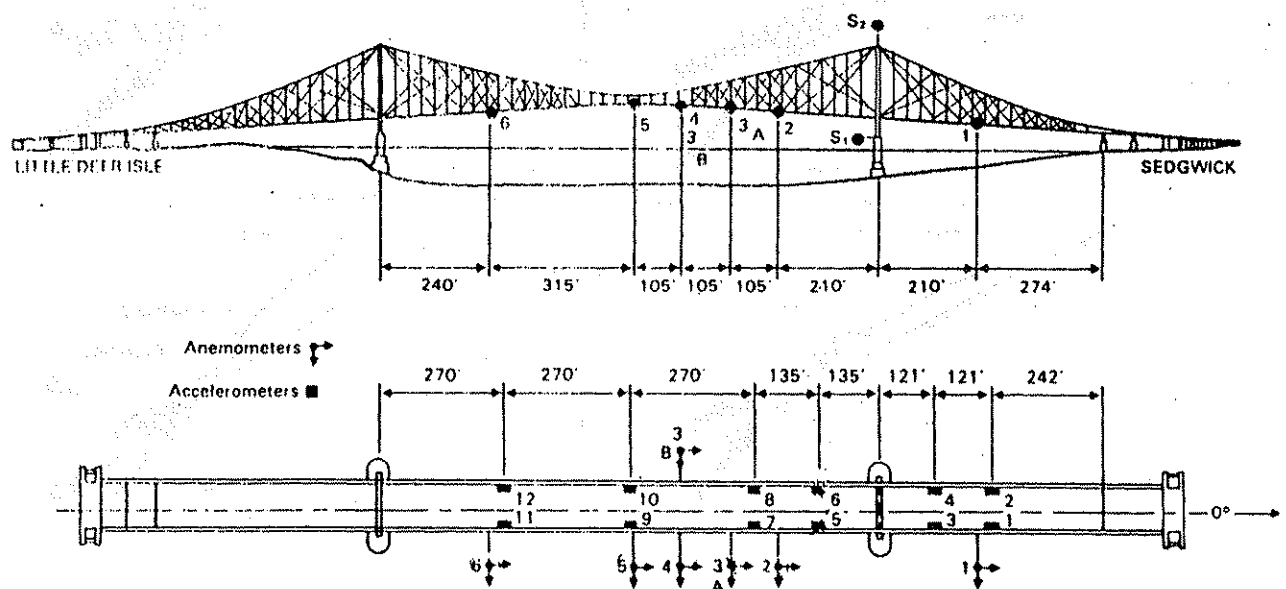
Deer Isle - Sedgwick Bridge -- Instrumentation Layout
